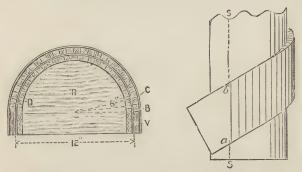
Plan of Cylinder for Building up Well. Fig. 177.—Part Elevation of Cylinder and Well.
